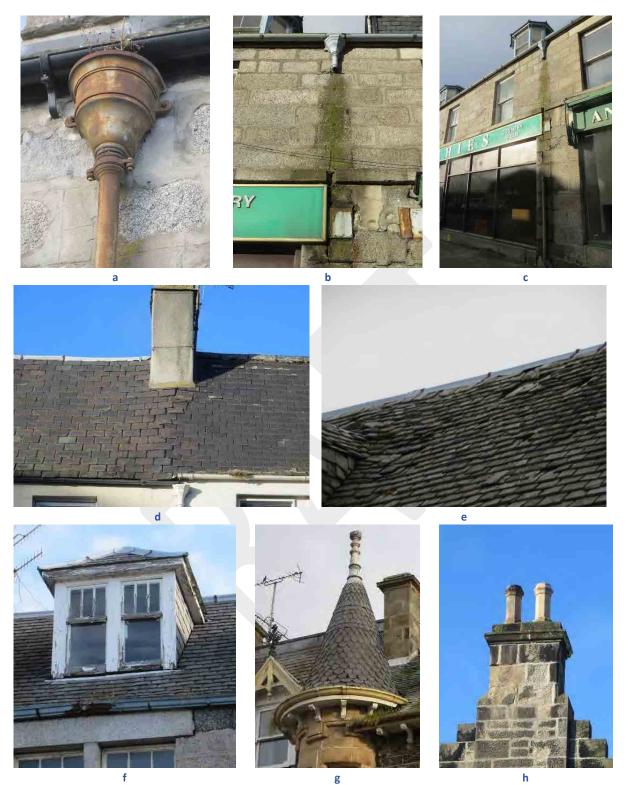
Examples of disrepair: cast iron in need of painting and missing rainwater goods (a-c); slates poorly laid at the junction of 2 properties - possibly original cope stones have been removed (d); missing slates (e); timber dormer in need of repainting (f); blocked gutters (g); and eroded high level stonework (h).
